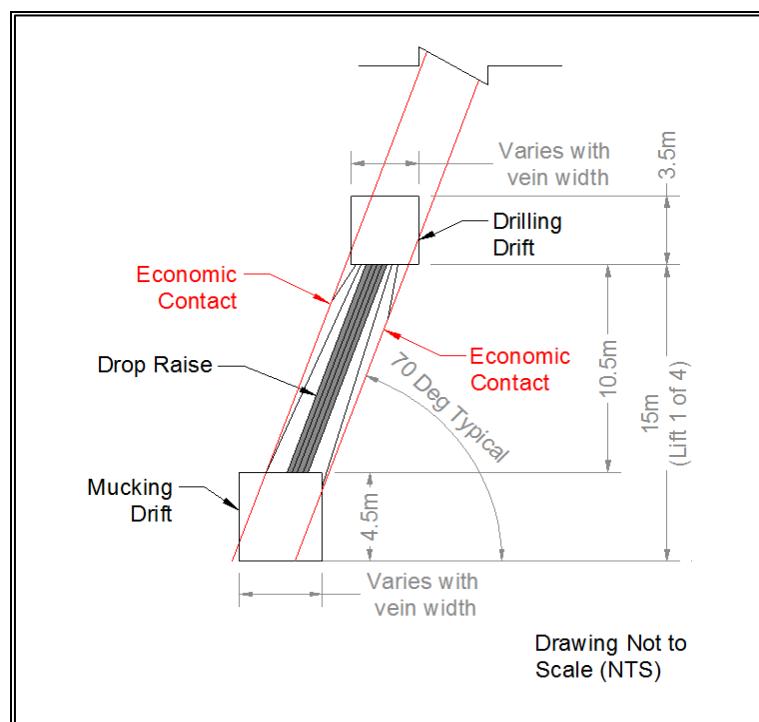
and Figure 16.18 show a typical longitudinal section and cross section of a downhole stope of 15 m panel height (floor to floor), typical width of 4 m, and length of 30 m. Longhole stopes account for approximately 75% of the planned stope tonnage. Approximately 10% is envisaged from transverse stoping and longhole uppers. The remaining 15% of planned stope tonnage will be from drift and fill (see Section 16.7.3).
